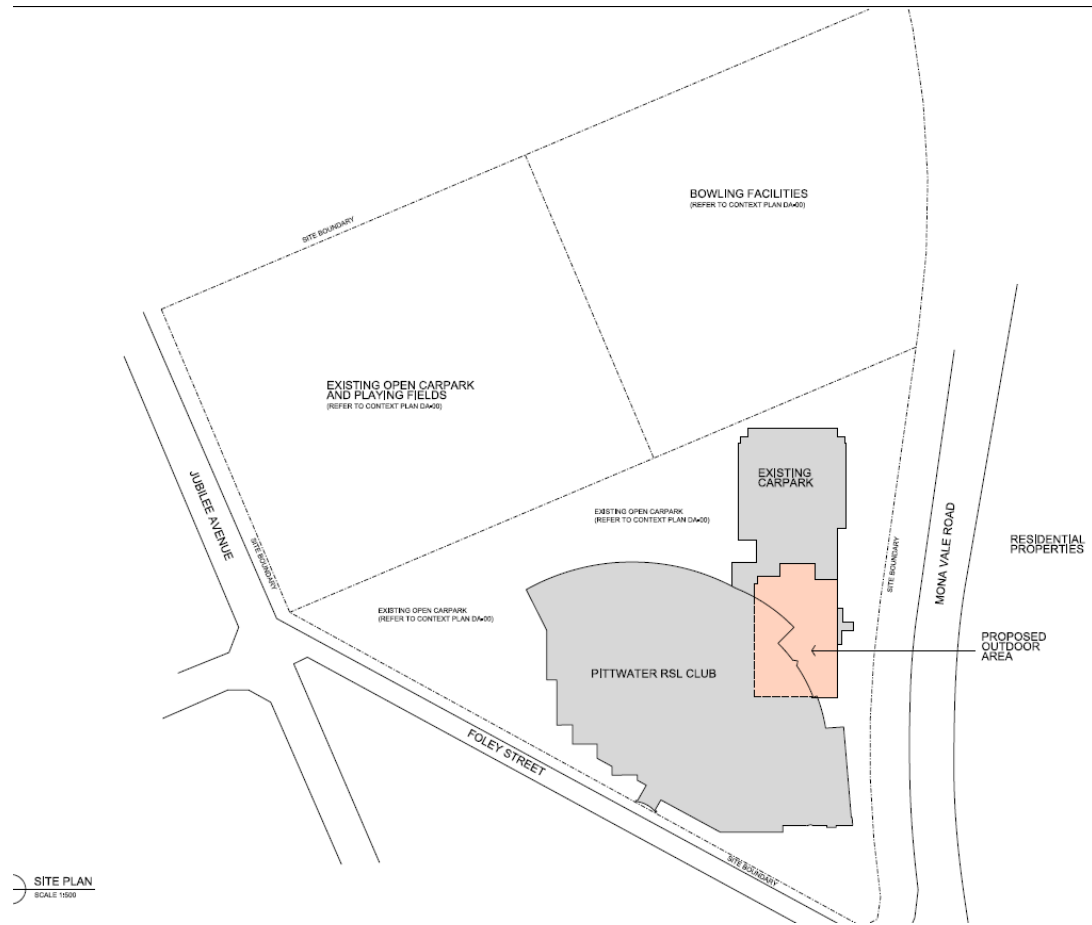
Location of proposed temporary outdoor dining area (Source: Site Plan prepared by Curtin Architects)
